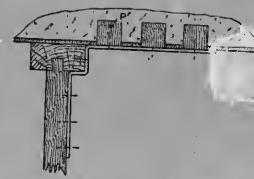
Brass Strap and Wall Plugs for Overdoor,
